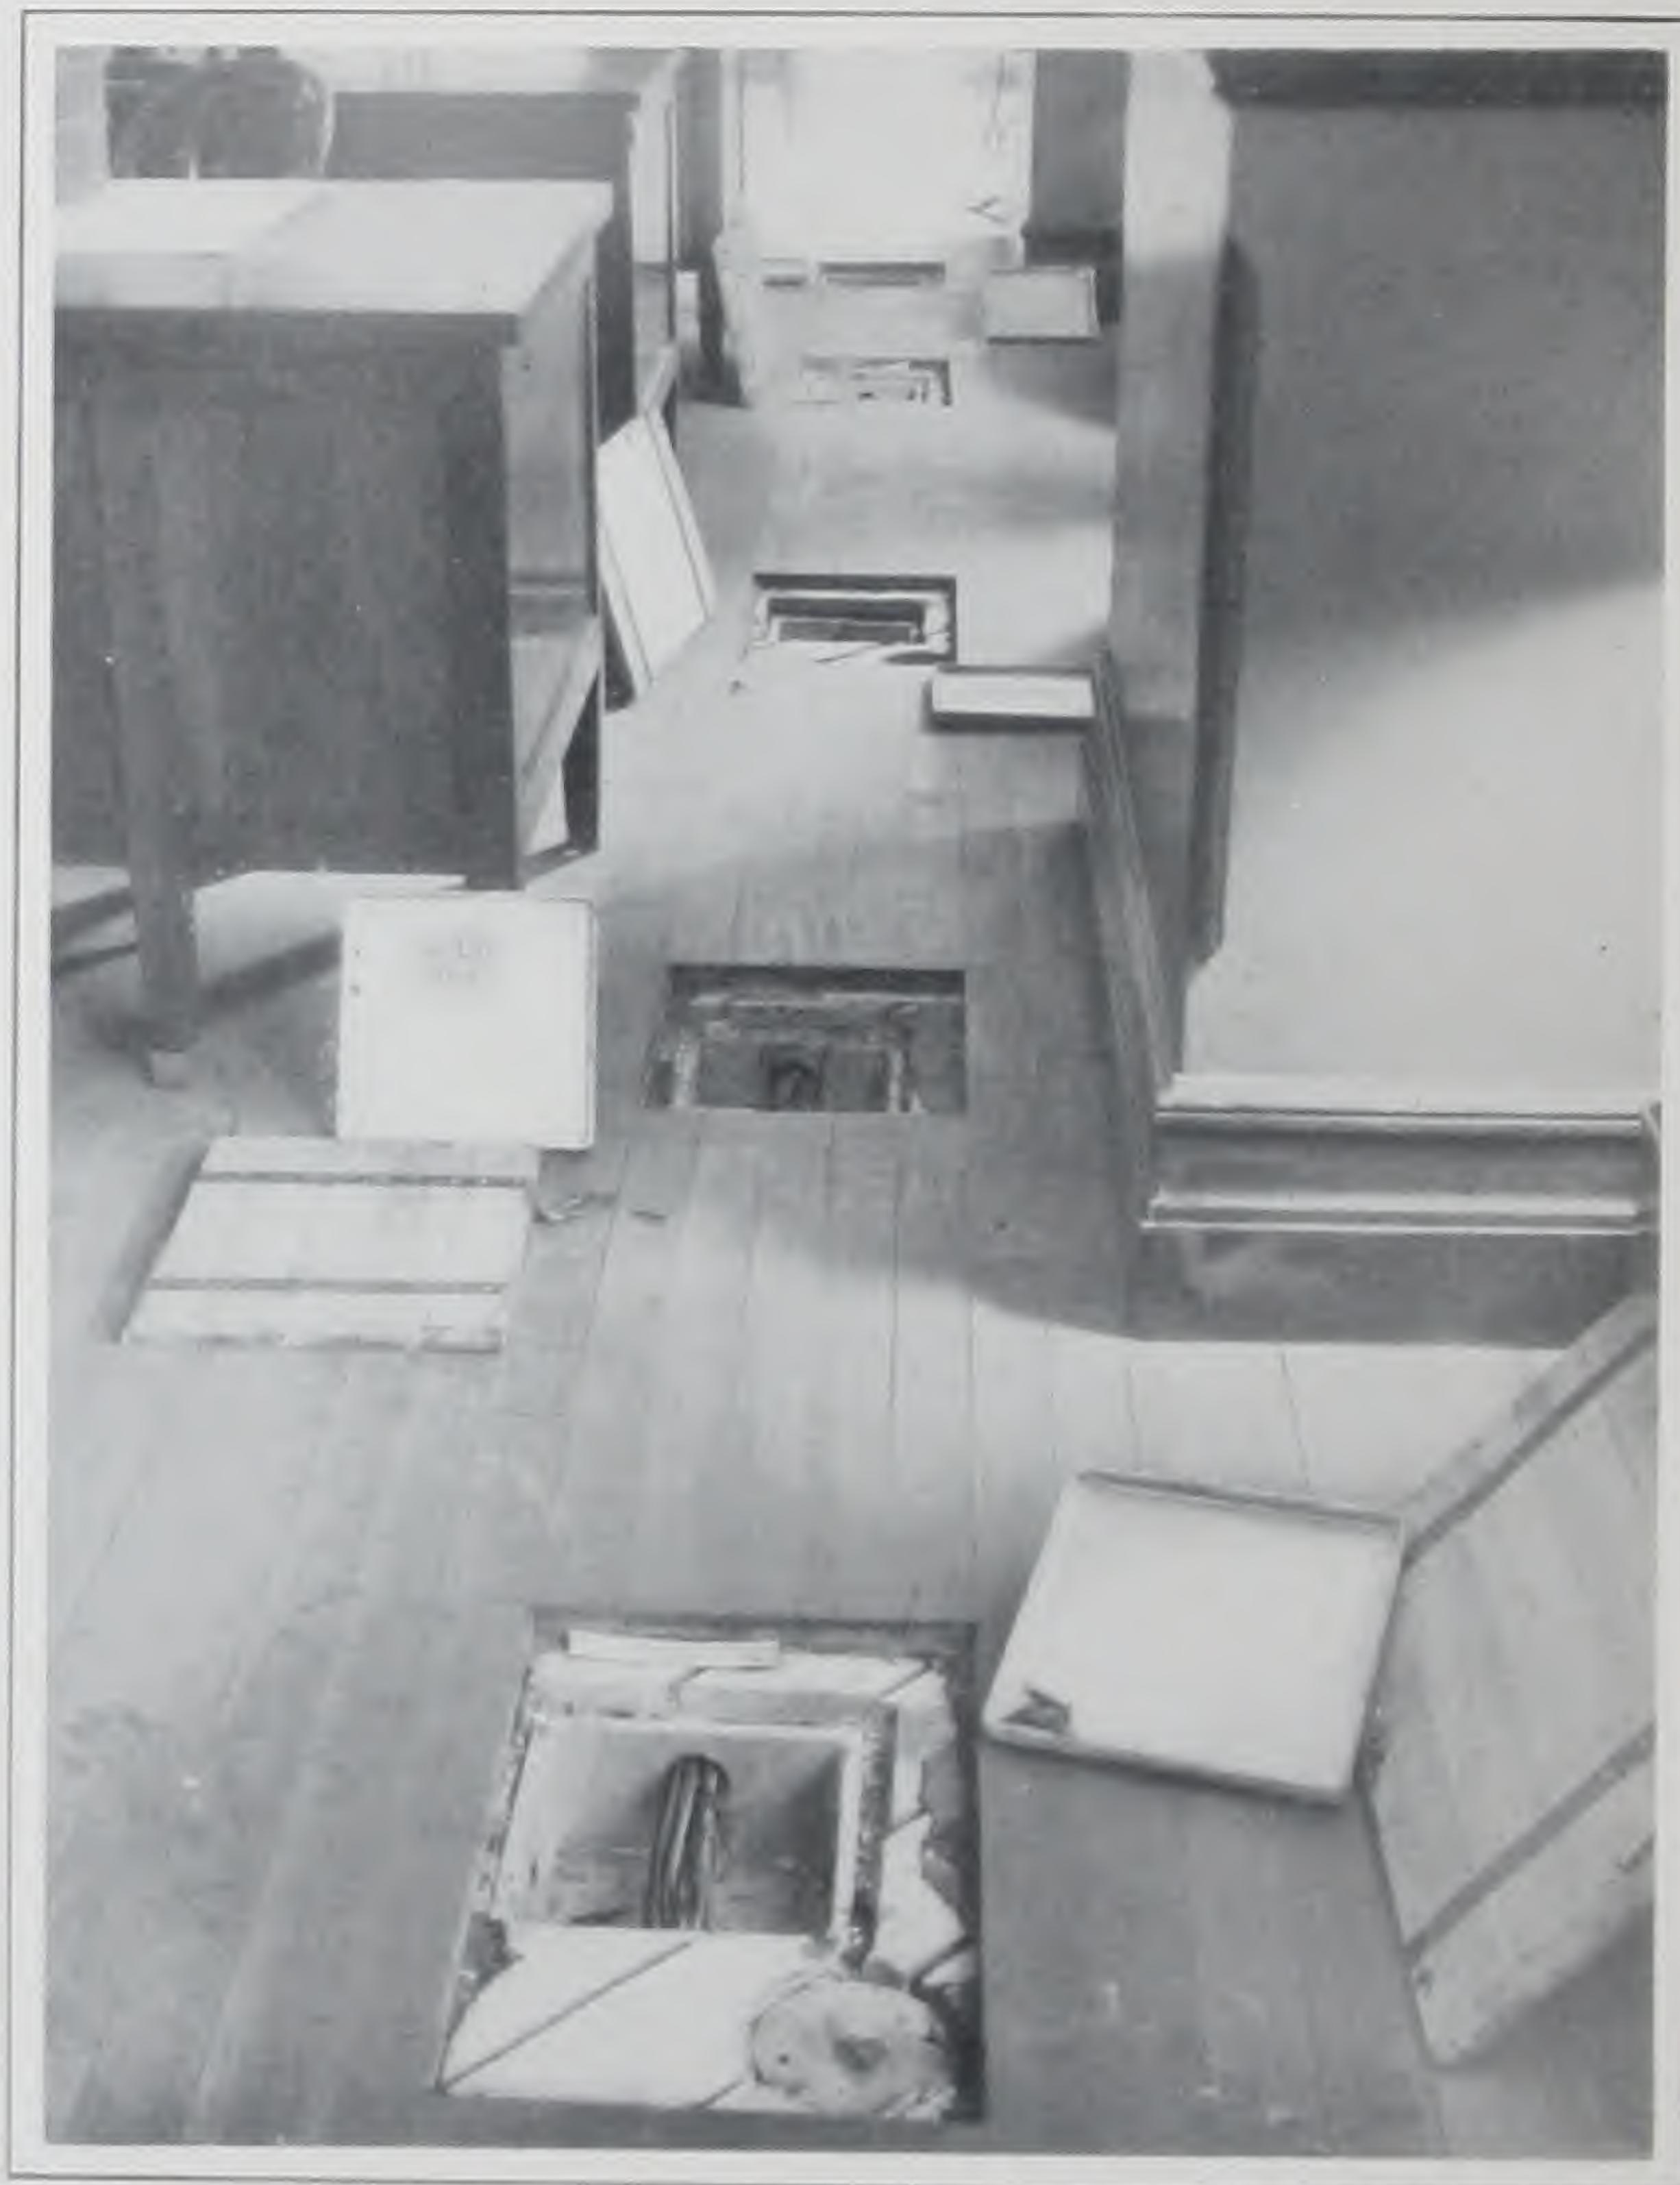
Trap Doors of Pull Boxes in Under-Floor Distribution
